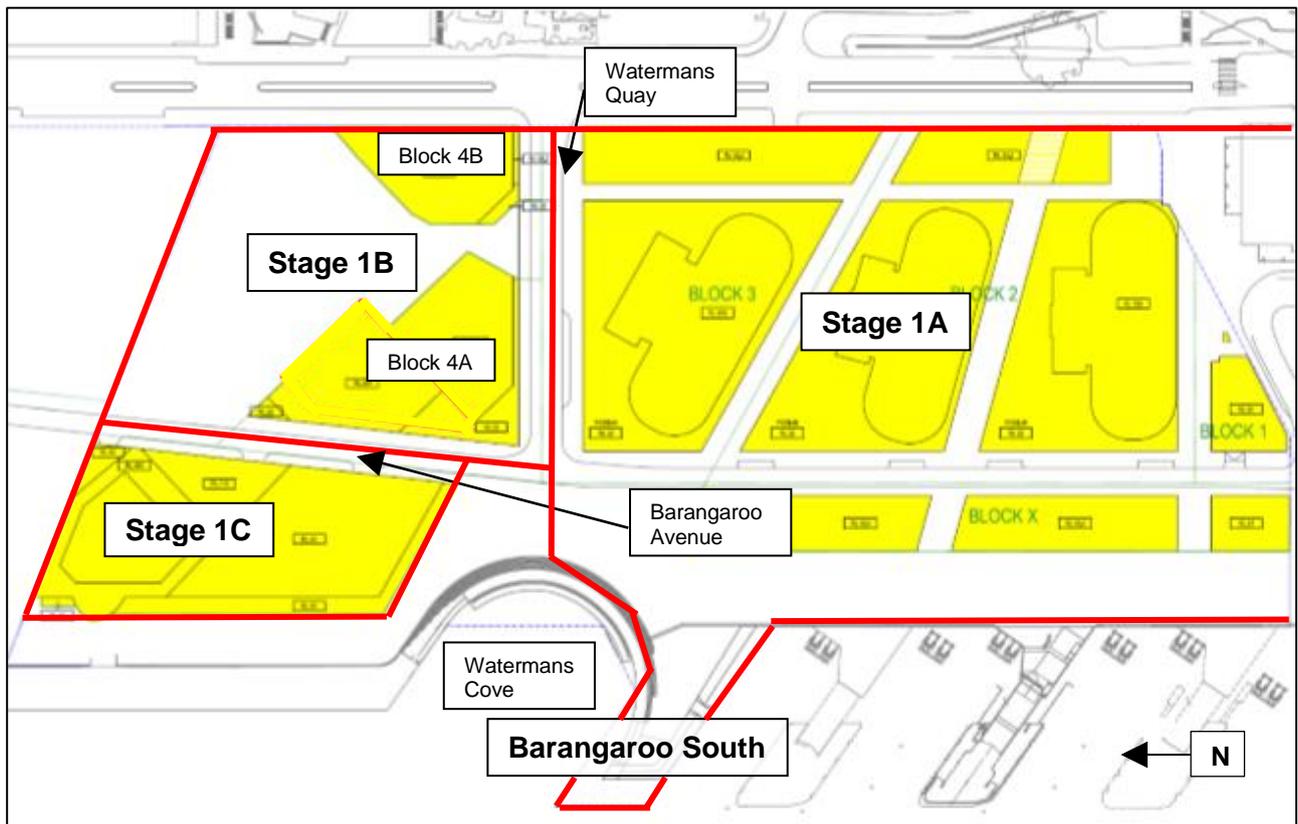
Barangaroo South Concept Plan blocks and construction stages (Base source: EIS)
